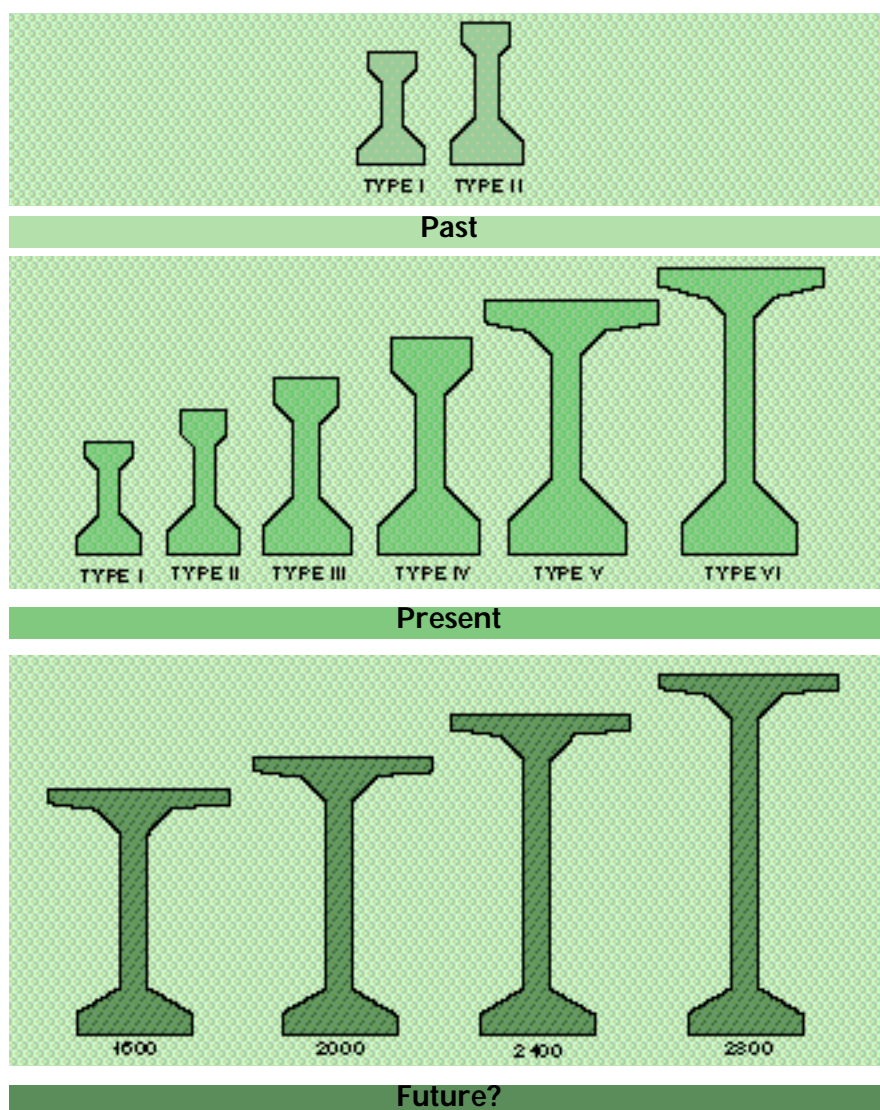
Standard shapes for precast/prestressed I-girders have evolved since the 1950s. Original stocky girder shapes are being replaced with deeper sections for longer spans and heavier loads. University of Nebraska researchers propose a new generation of I-girder shapes with metric dimensions. Differing only in overall depth, these shapes are proportioned to be efficient for the field post-tensioning required to achieve long clear spans.
